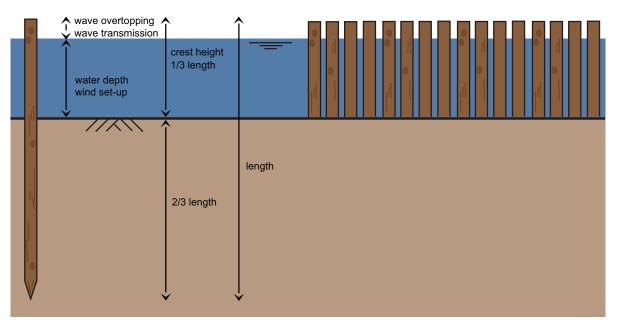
Cross-sectional View (left) and Side View (right) of Timber Pile Breakwater
